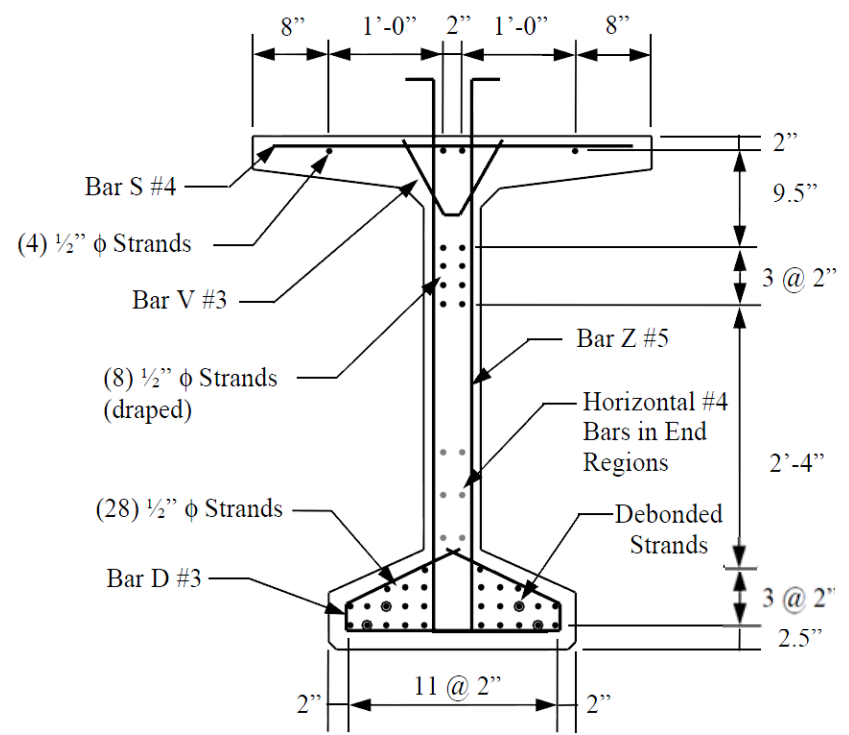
Cross Section of BT-54 and BT-72 Girder (Adapted from Johnson [2012])
